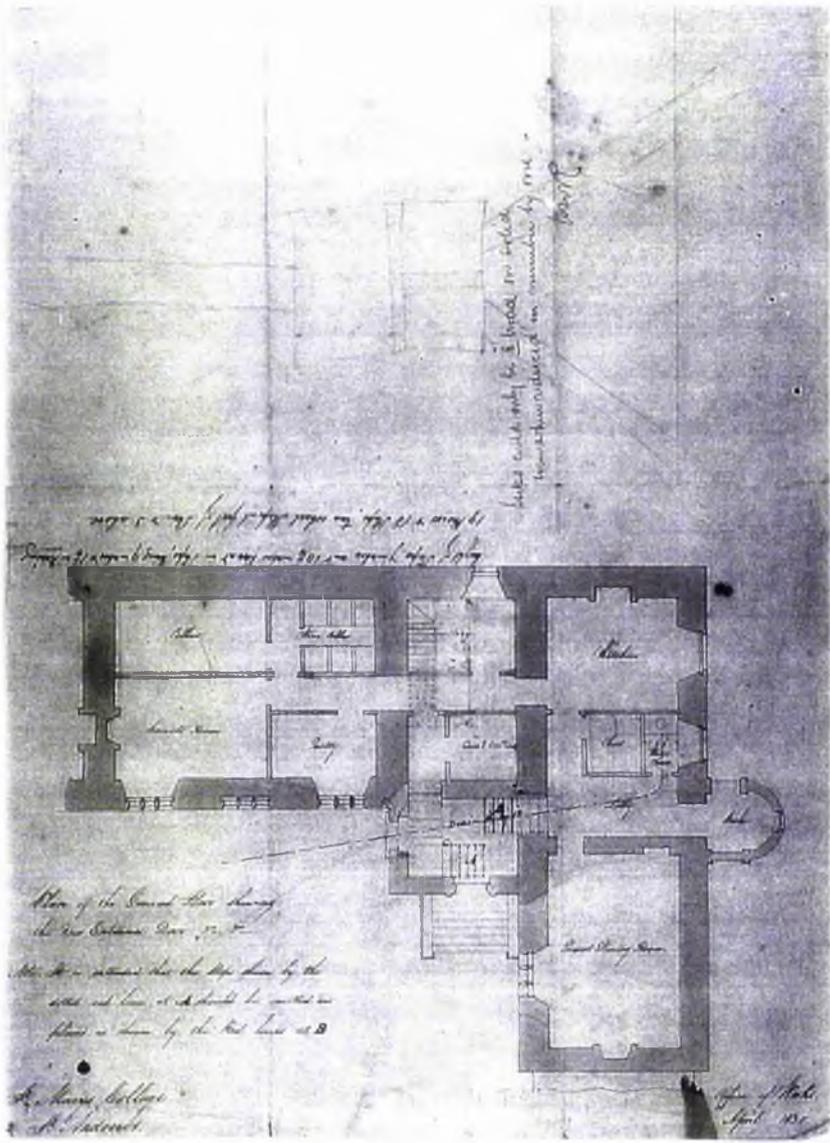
St.Mary's College. Proposed alterations to ground floor of Principal's House. R. Reid, April, 1830.
